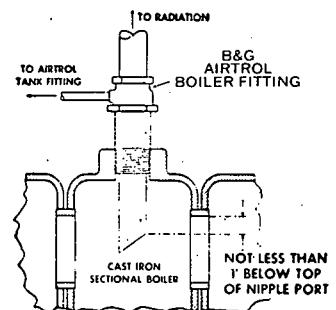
Airtrol Boiler Fitting installation in a cast iron boiler, showing correct depth of tube.
